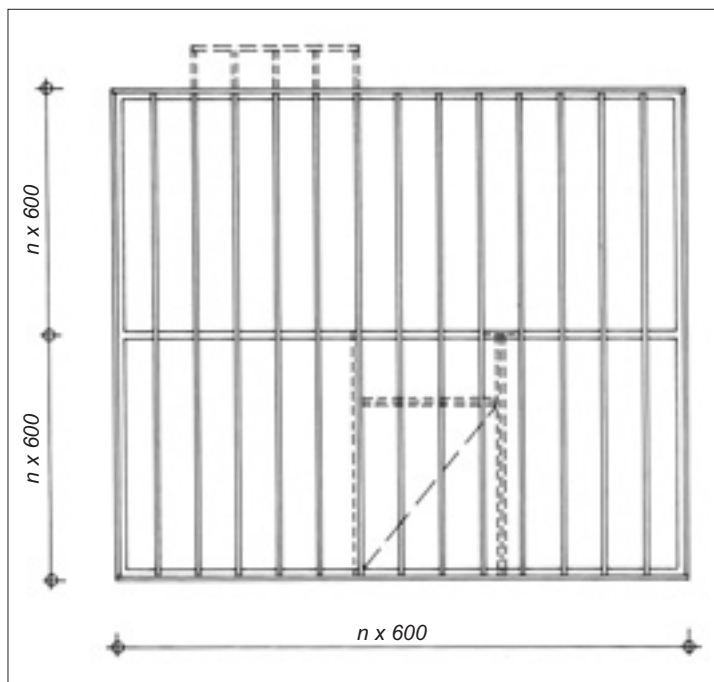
Typical joist choice for a detached house. The long external walls are load-bearing and there is another joist support in the middle of the building. The joists extend over the mid-support without a break.
